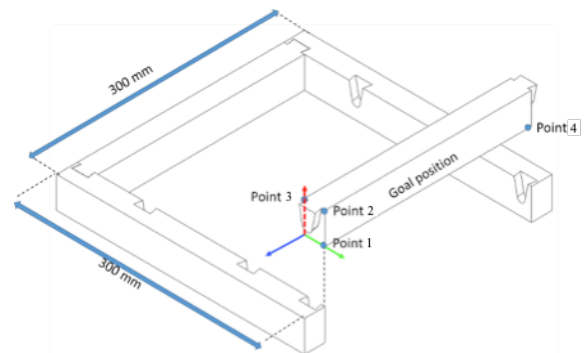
Prefabricated module mockup used for the assembly in laboratory environment experiments
